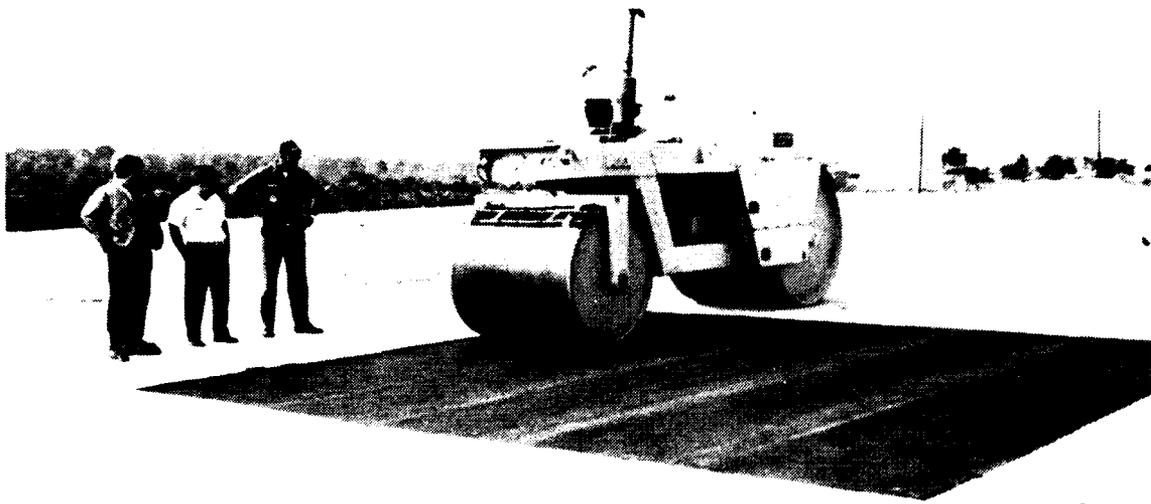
Twelve-Ton Tandem Steel Wheel Roller
